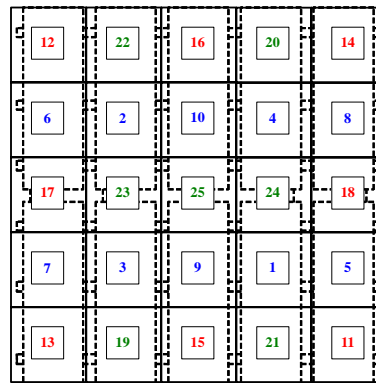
Placement of Sandbags on First Story in Outdoor Load Test on Heavy-duty Scaffolds with Shores
